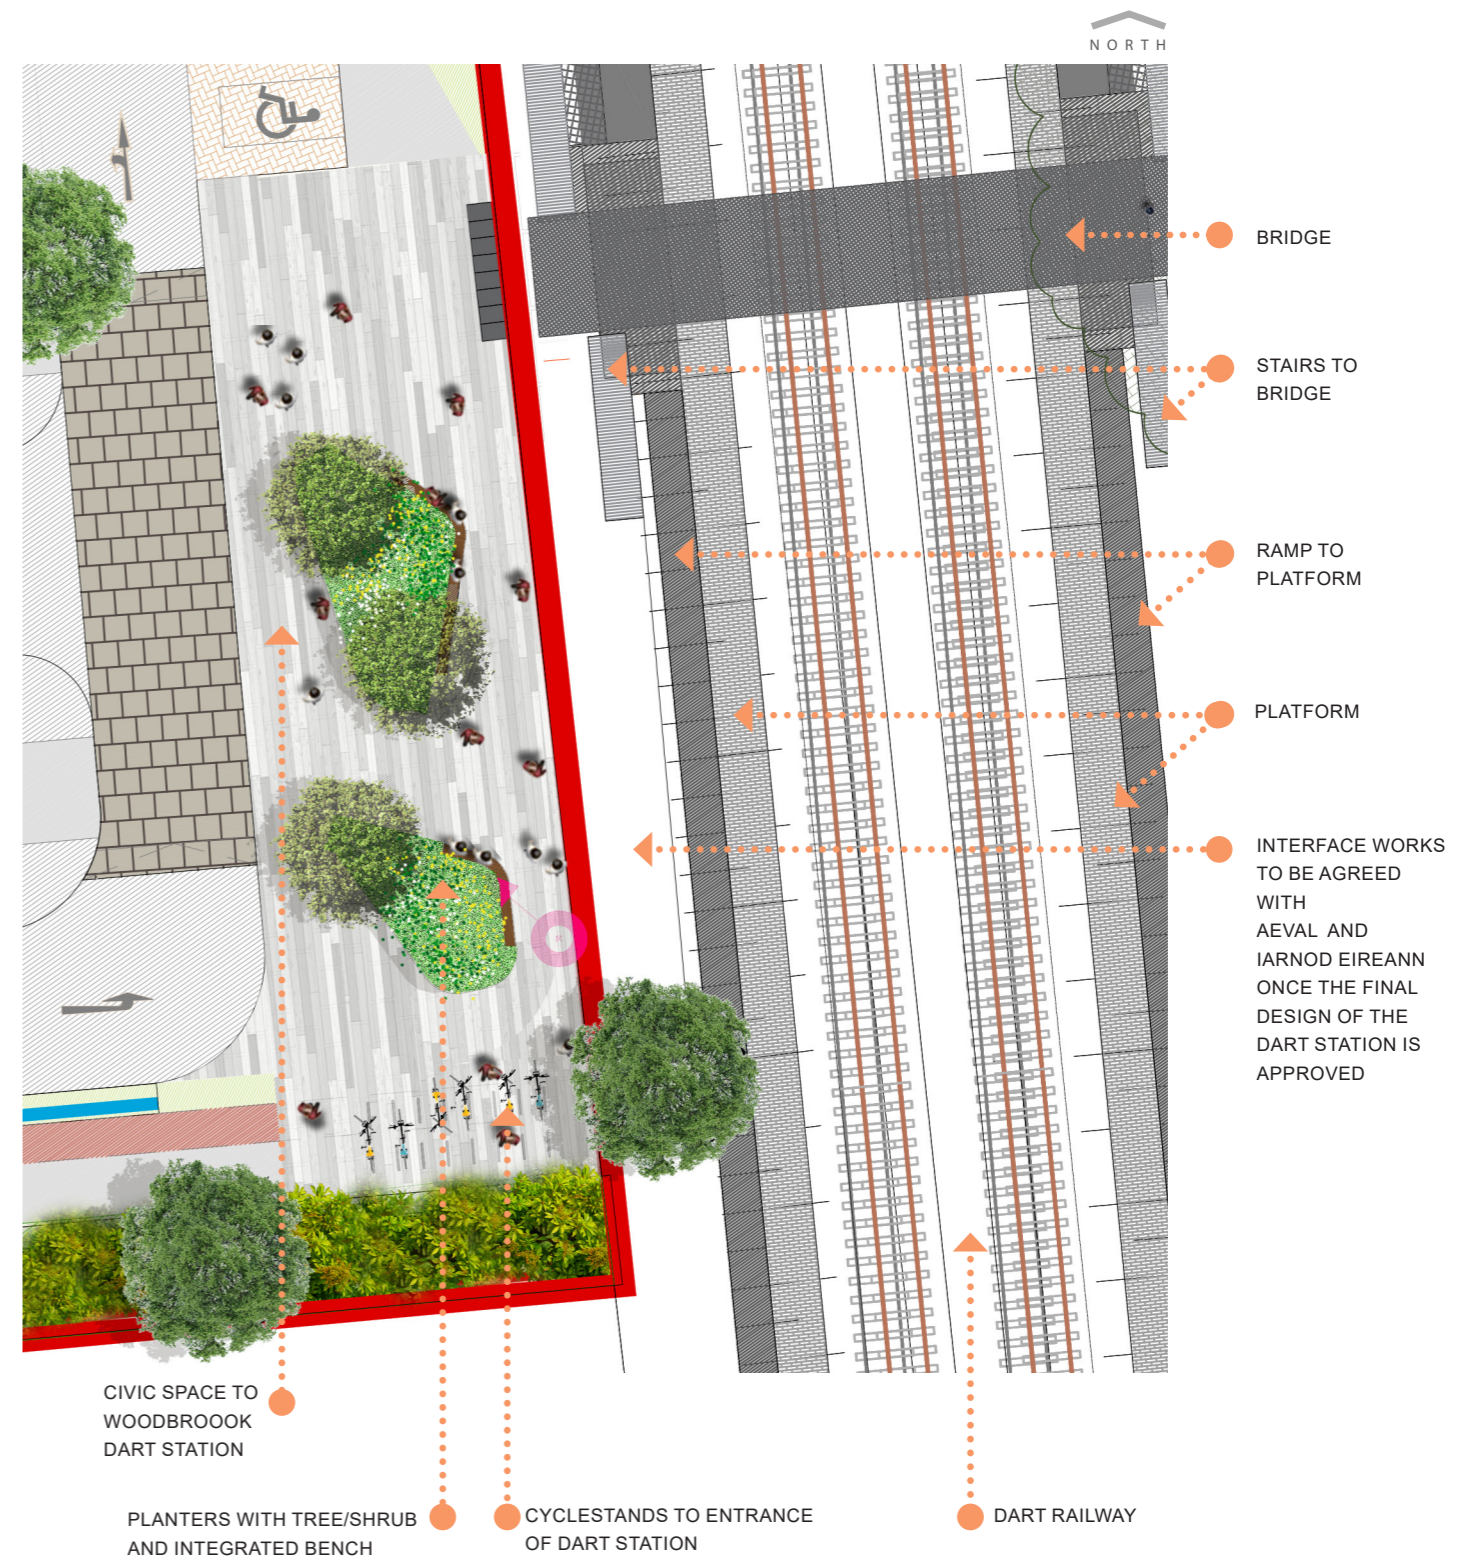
Plan of Civic Space to Woodbrook Dart Station
